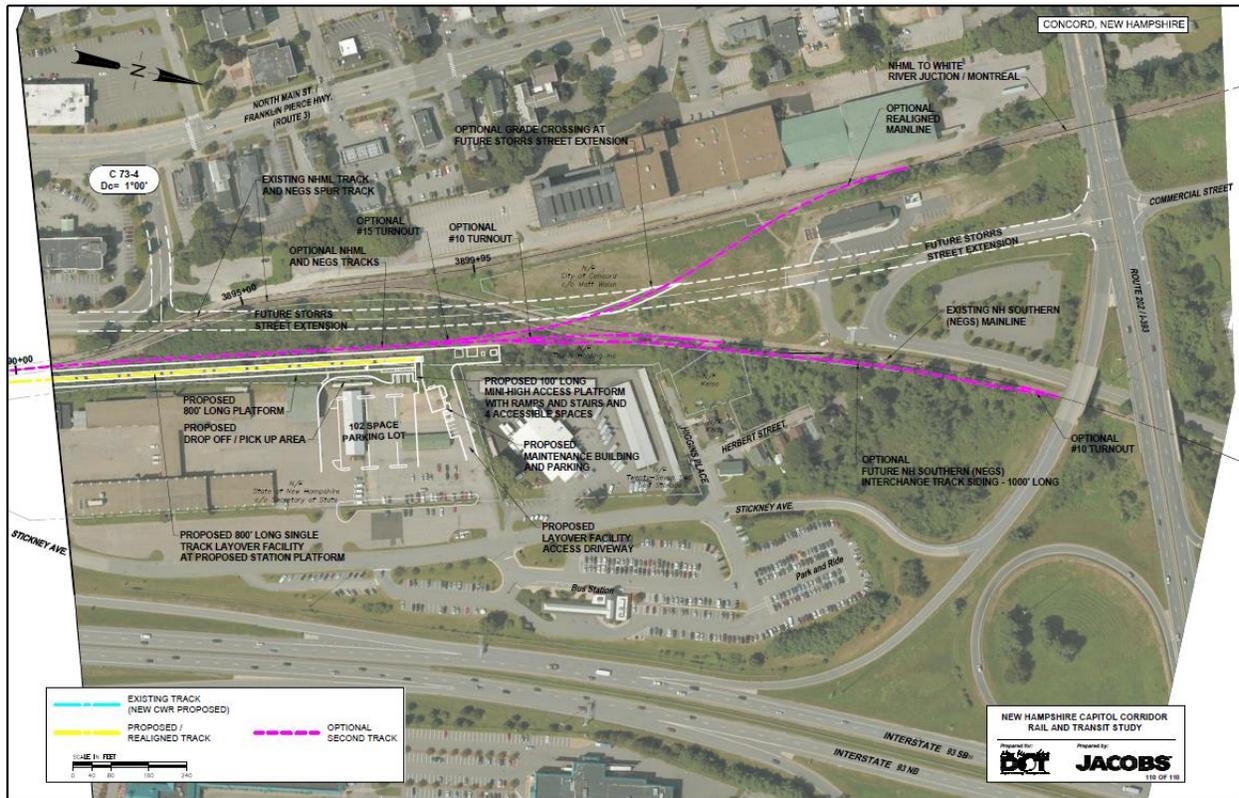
City of Concord Storrs Street Extension Plans
